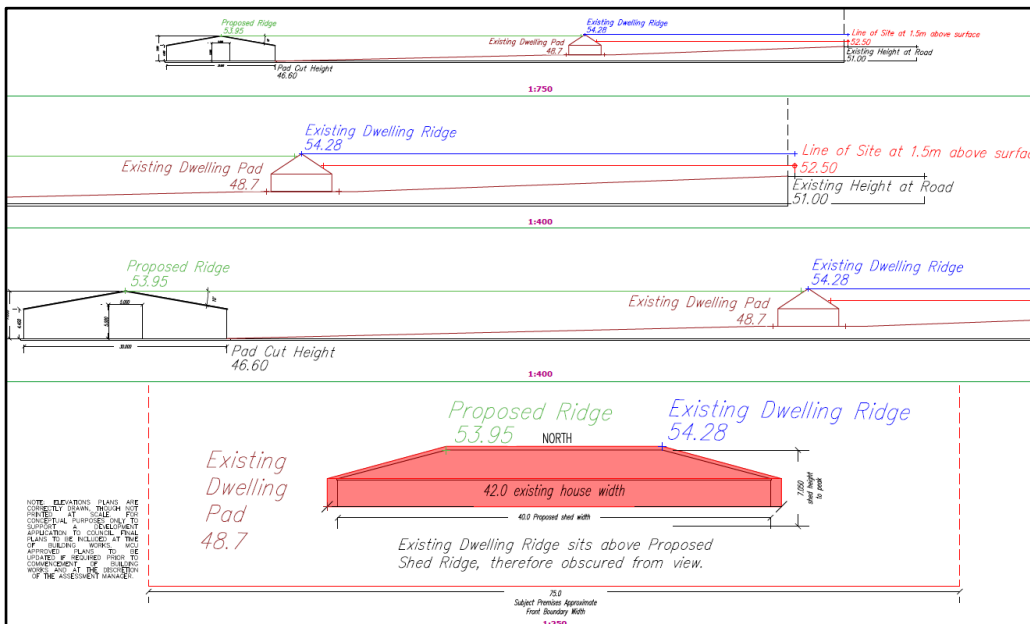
Line of Site - Baird & Hayes - Elevations Plan
